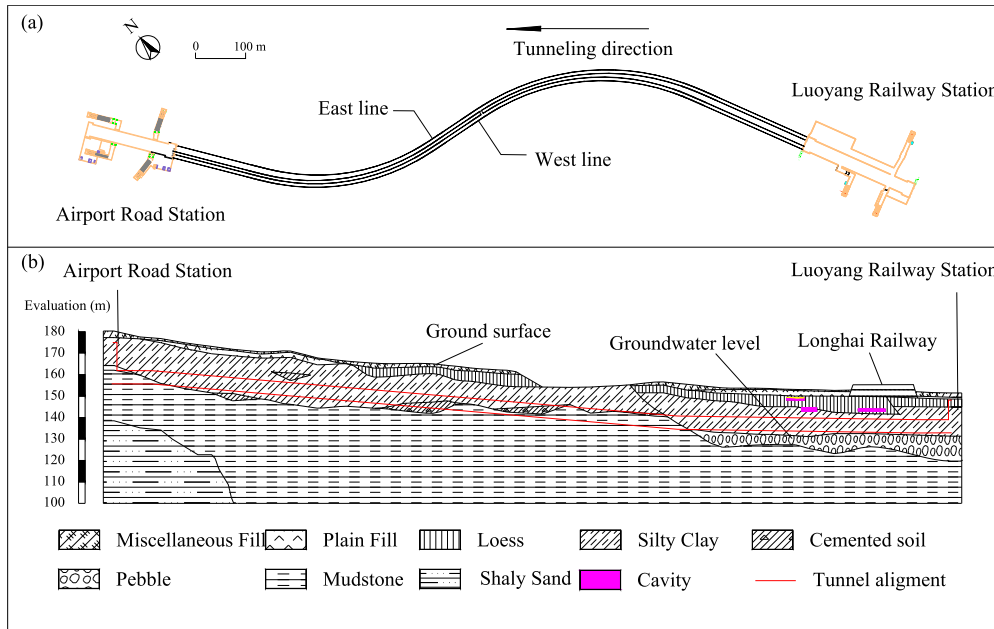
Site review: (a) plan view of tunnel section and (b) geological profile of site.
